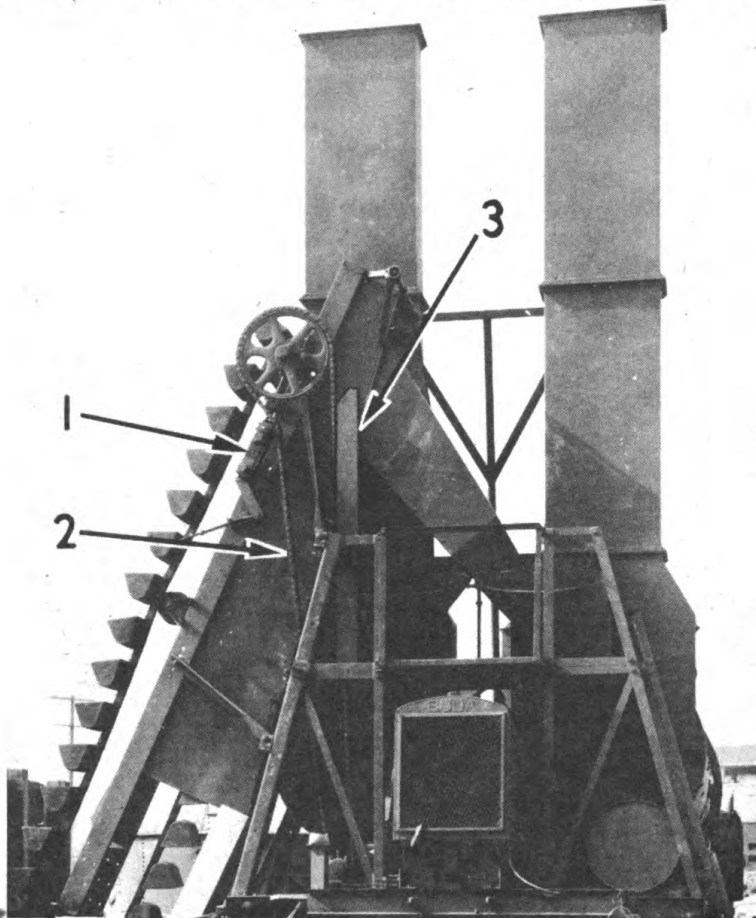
"DRYER CHARGING END SHOWING ERECTED POSITION OF COLD ELEVATOR WITH DRIVE CHAIN INSTALLED."
